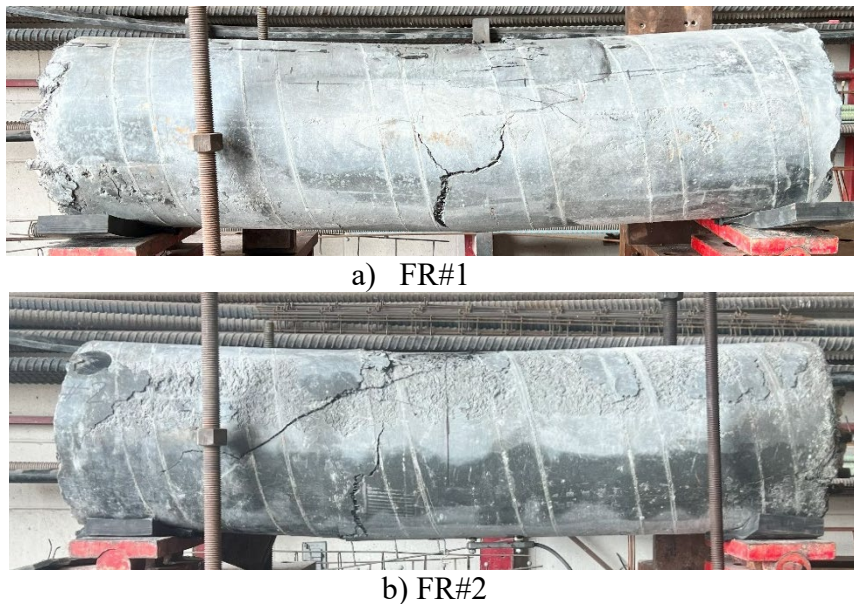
Modes of failure of a) specimen FR#1 and b) specimen FR#2
